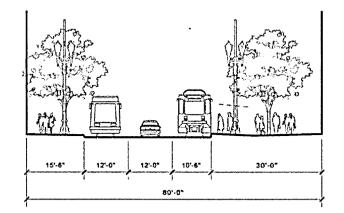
Section of South Mall Station Block - 5th Avenue looking south. PSU's Urban Center to the right.
